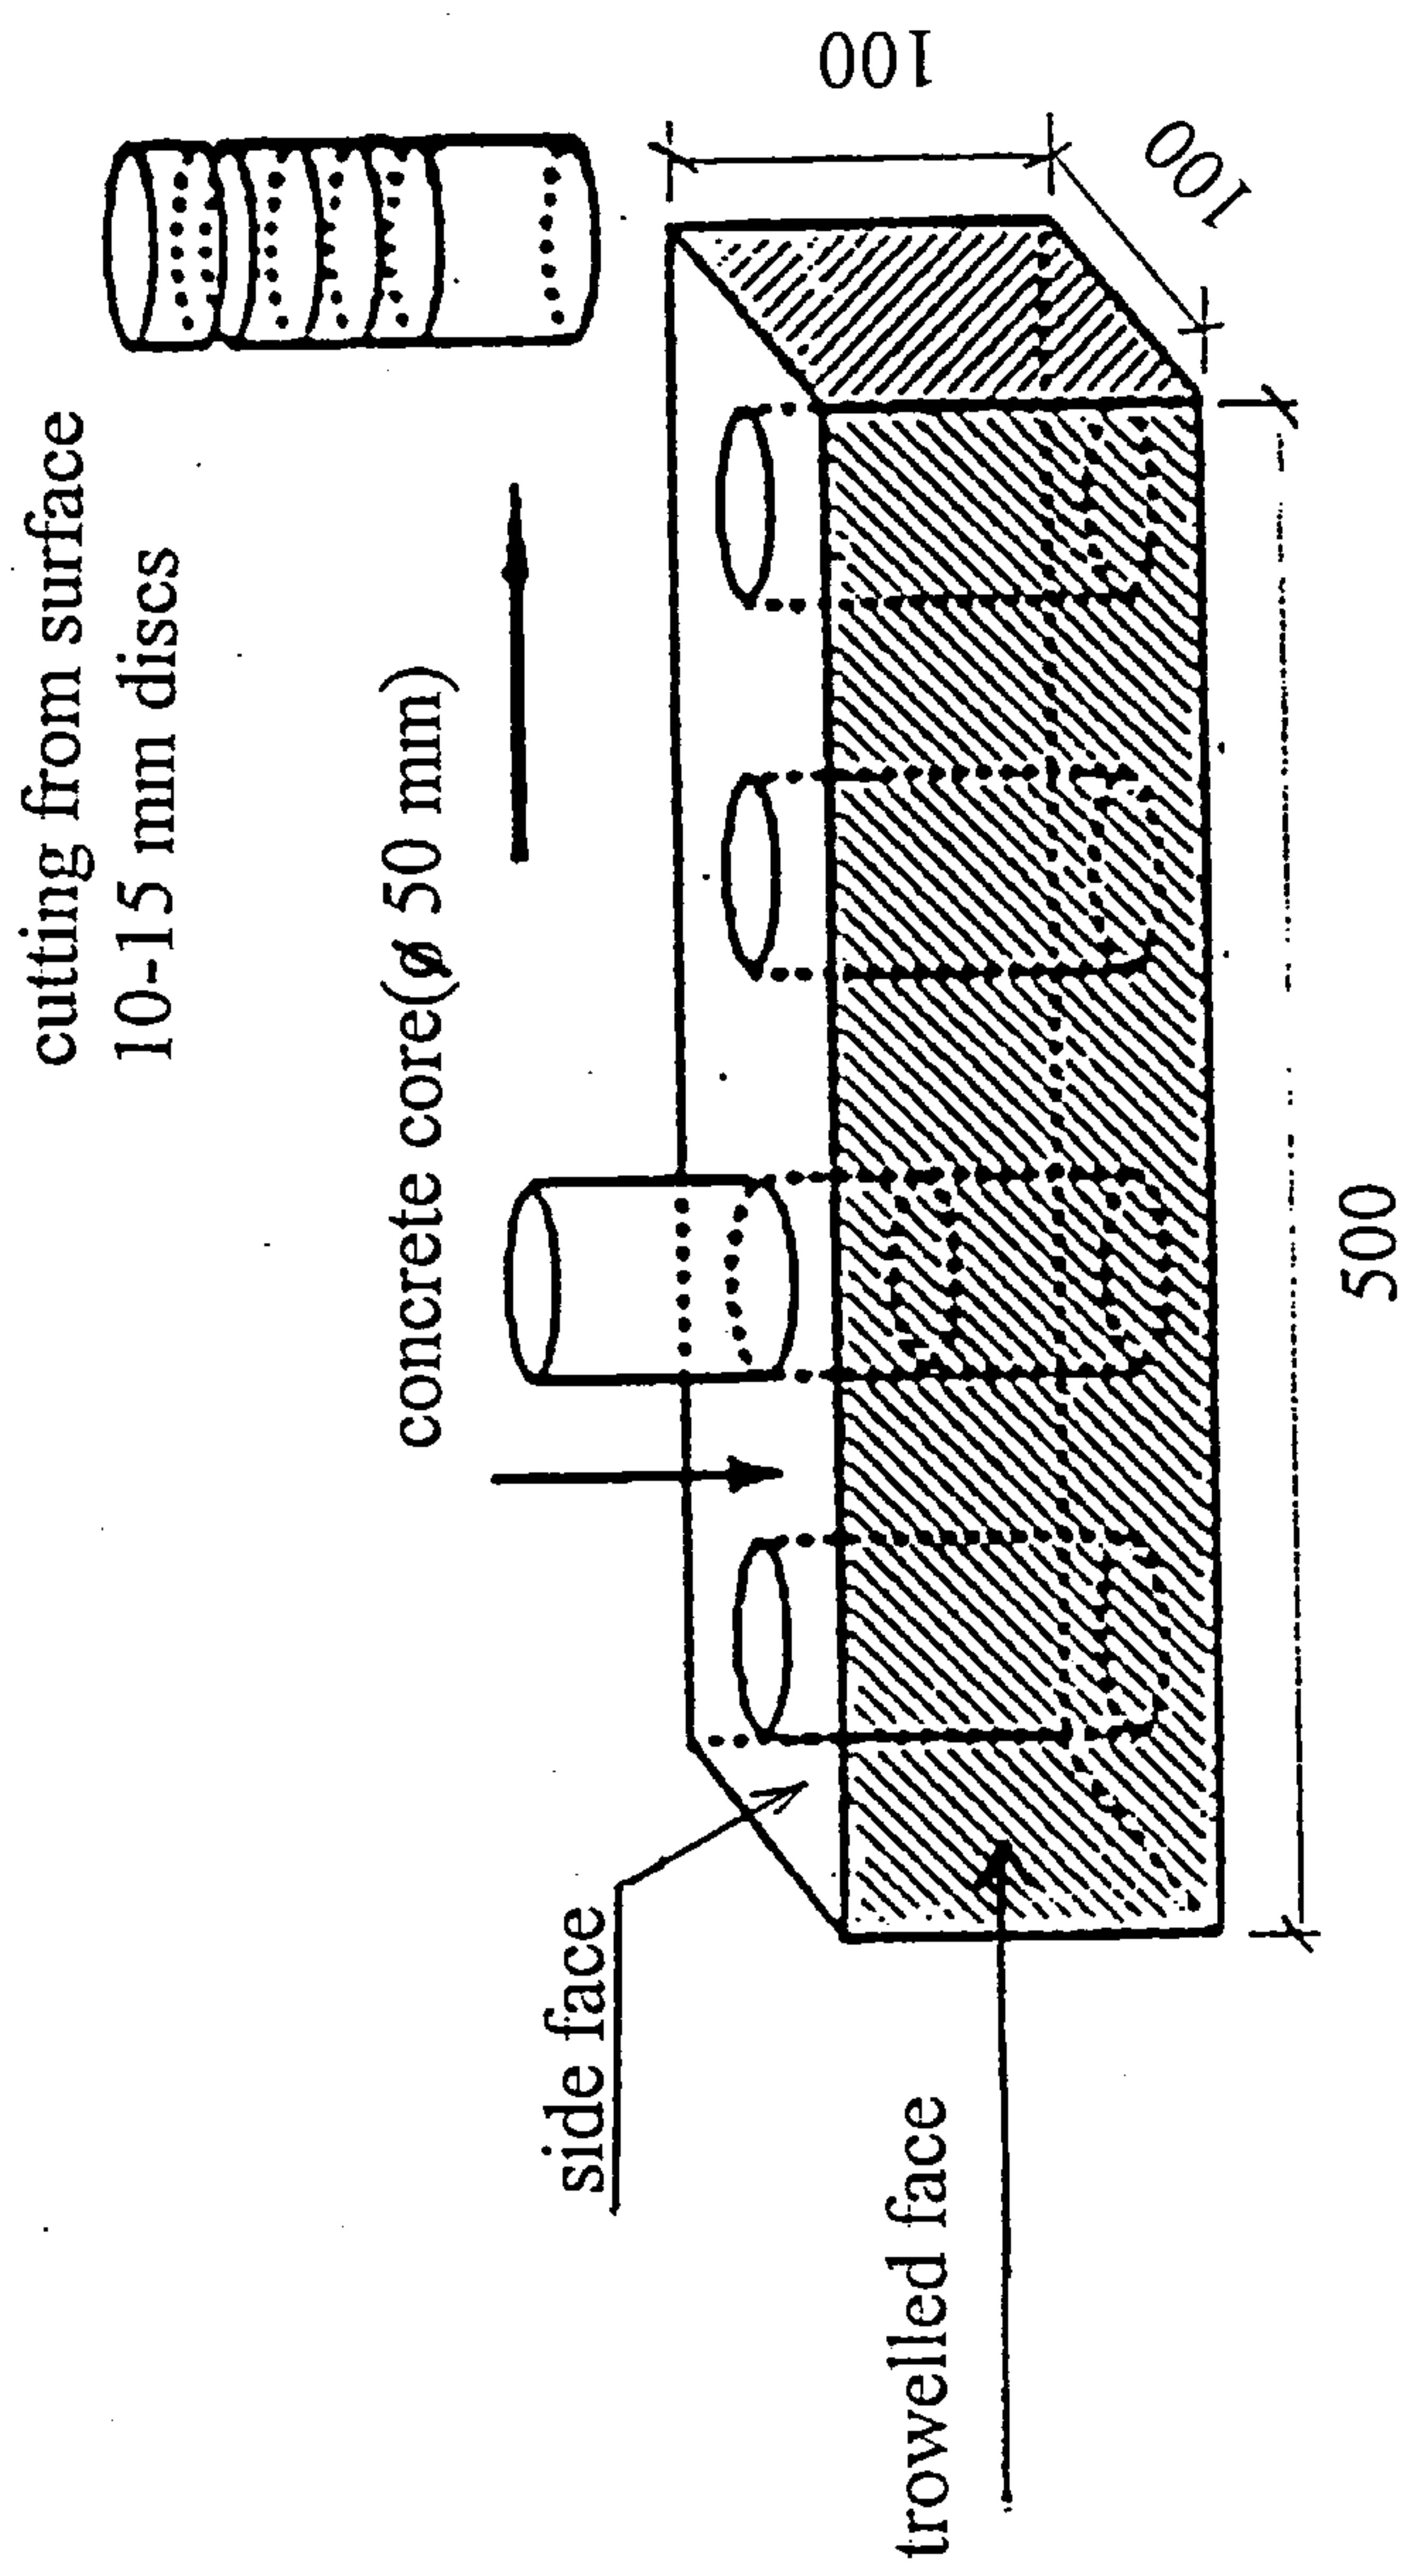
Schematic diagram of a concrete specimen extracted for permeability test.
